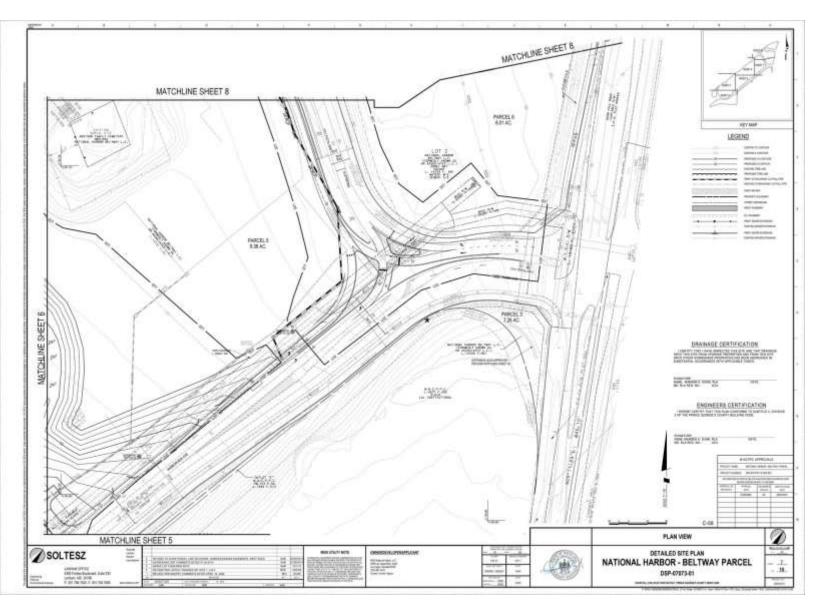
DETAILED SITE PLAN SET (PAGE 6 OF 10)
